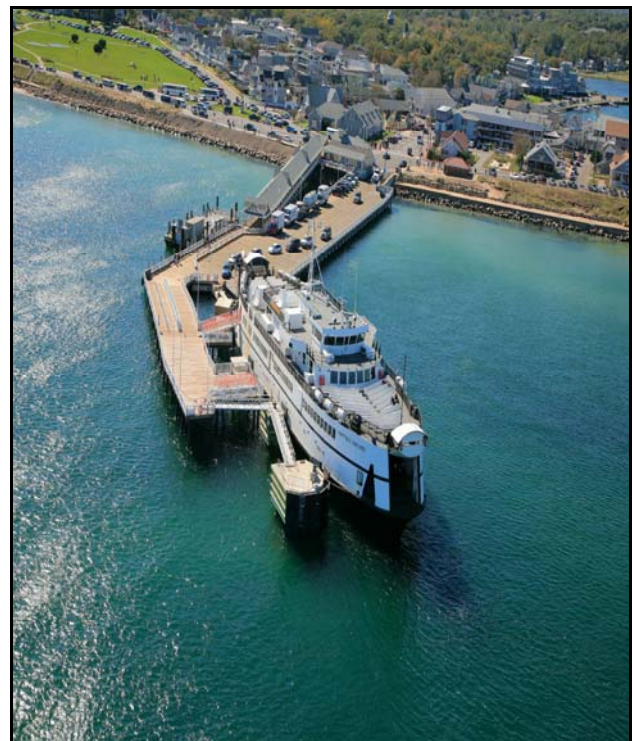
Completed Pier Facility at the Oak Bluffs Terminal.
